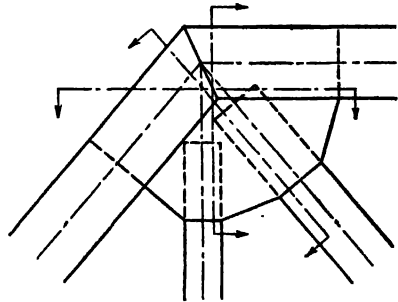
m. Sections for Testing Gusset-Plates at the Hip Joint.
